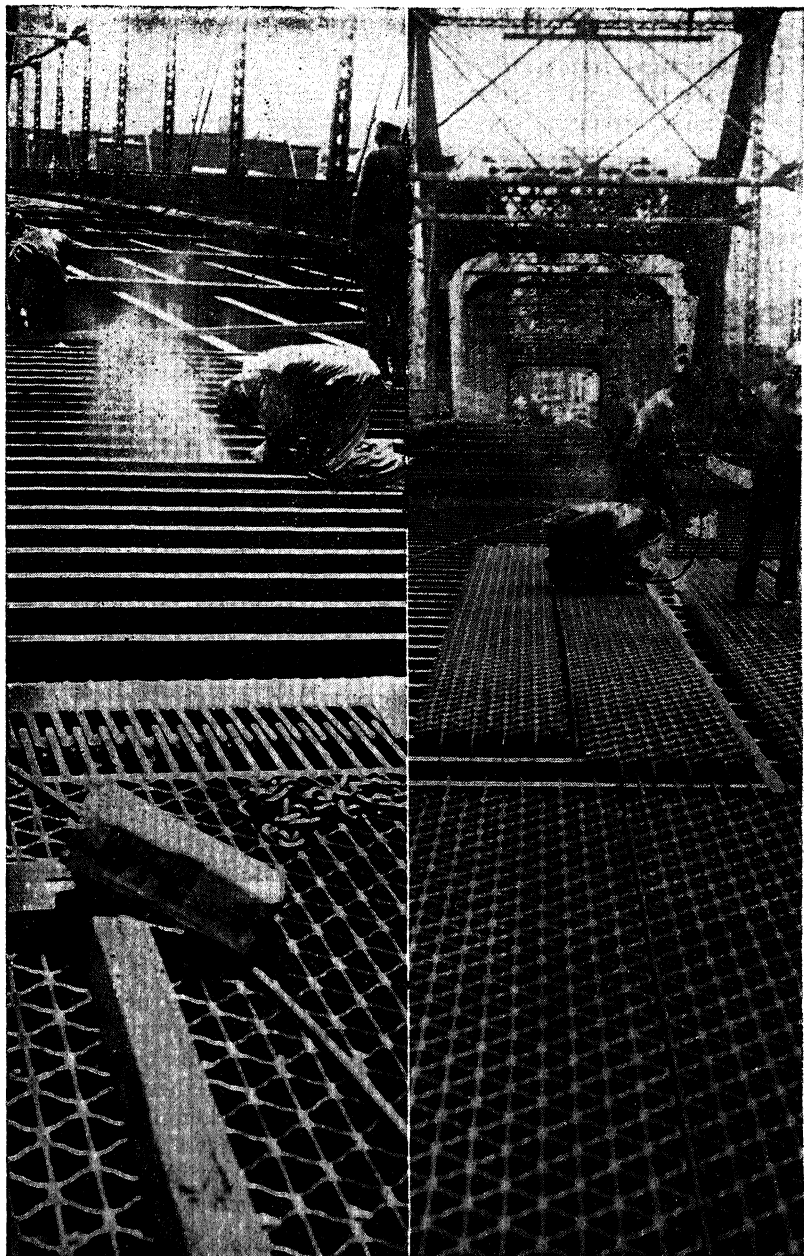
New steel cross beams (left) and grid type flooring applied to highway bridge in Penn. for length of 1119 ft. and width of 29 ft. 6 in. New steel floor weighs half as much as old wooden floor, enabling increased live load from H-15 to H-20 loading. Construction time one-half that required for wood floor. New steel-concrete floor is skid proof.
